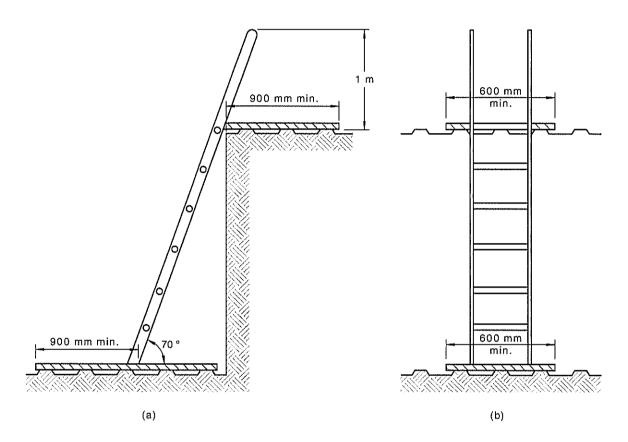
TYPICAL LANDING DETAILS FOR ROOF ACCESS LADDERS
